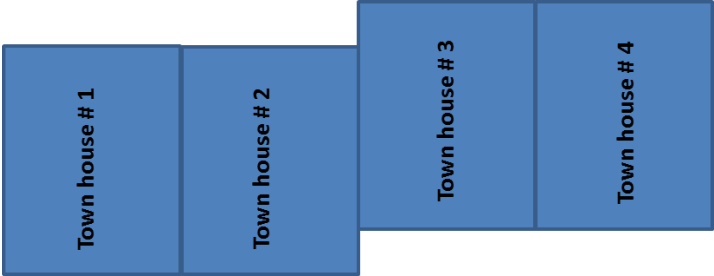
Plan view of the town houses layouts, as understood by the construction engineer, and the foundation were constructed accordingly
